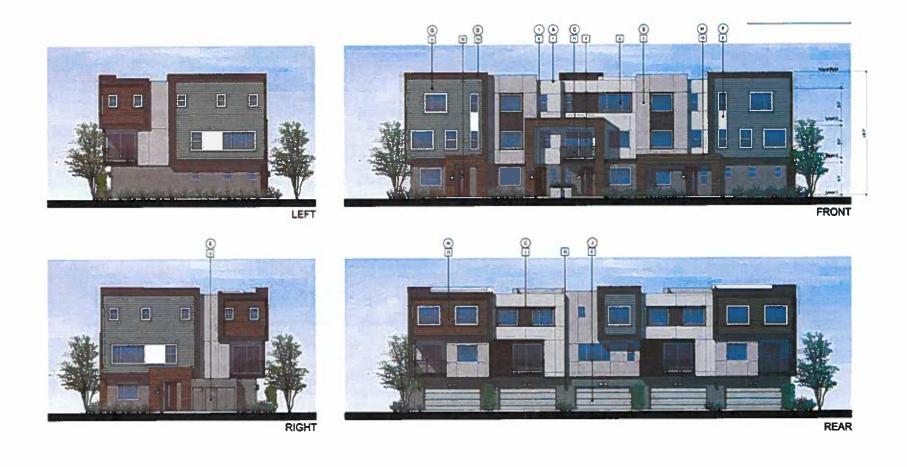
Conceptual Architecture - 6-Plex Building Elevation "F"
